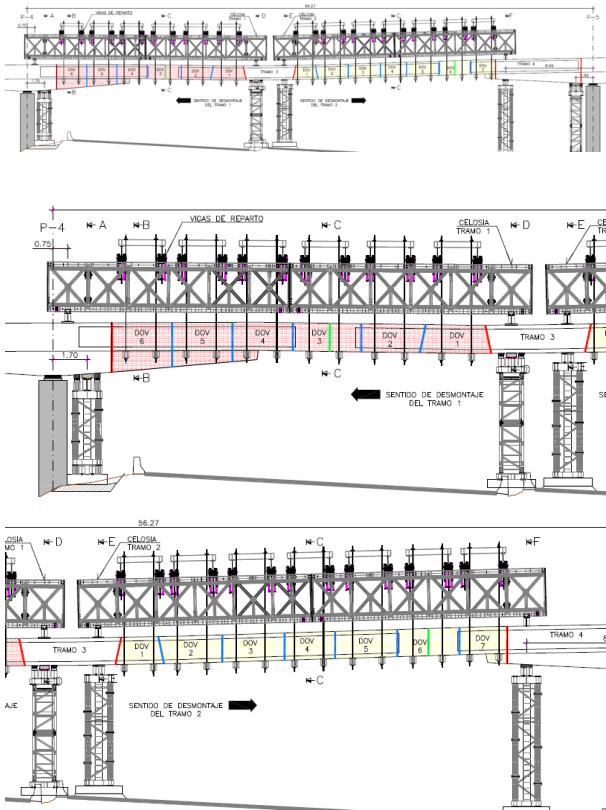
Deck sections distribution and cuts at span 5 over M-40.
